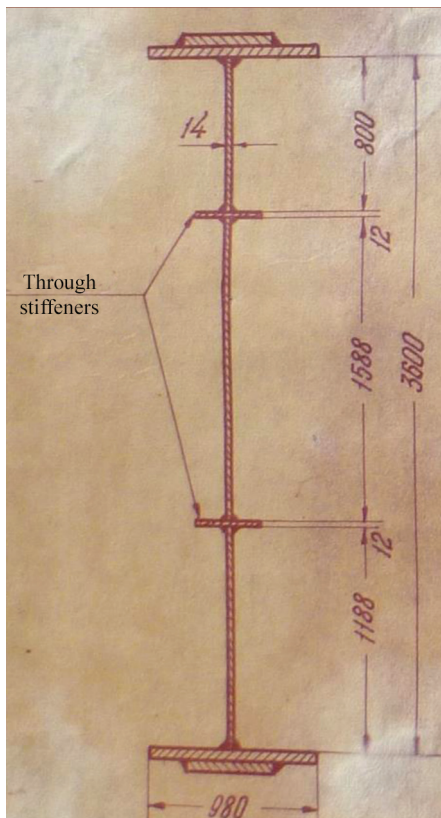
Cross-section of the truss of the main longitudinal beams of four- and five-span structures of the bridge [4]
